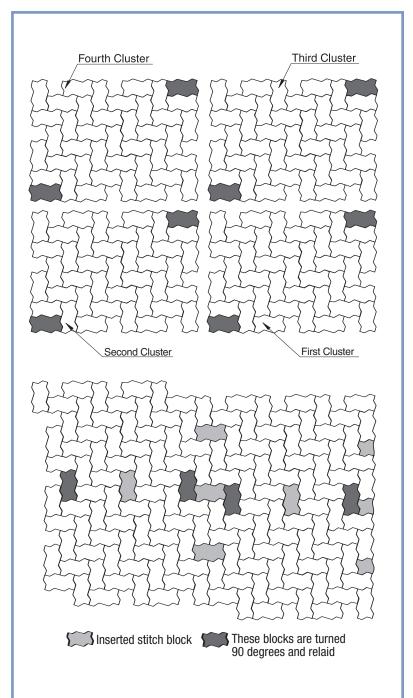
Upon machine placement of each cluster on the bedding sand, pavers at the corners were re-oriented and stitching pavers inserted or turned to create a consistent, fully interlocking surface across the pavement.
